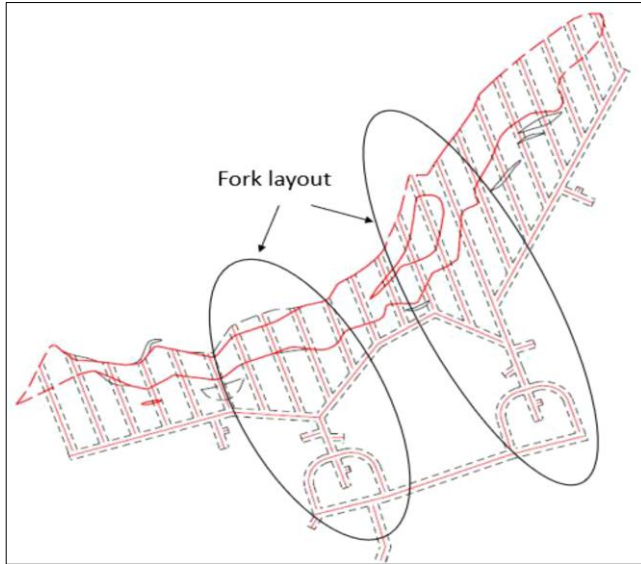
Plan view of the proposed layout of Level 536 for transverse sublevel caving with fork layout and 50 m sublevel height
